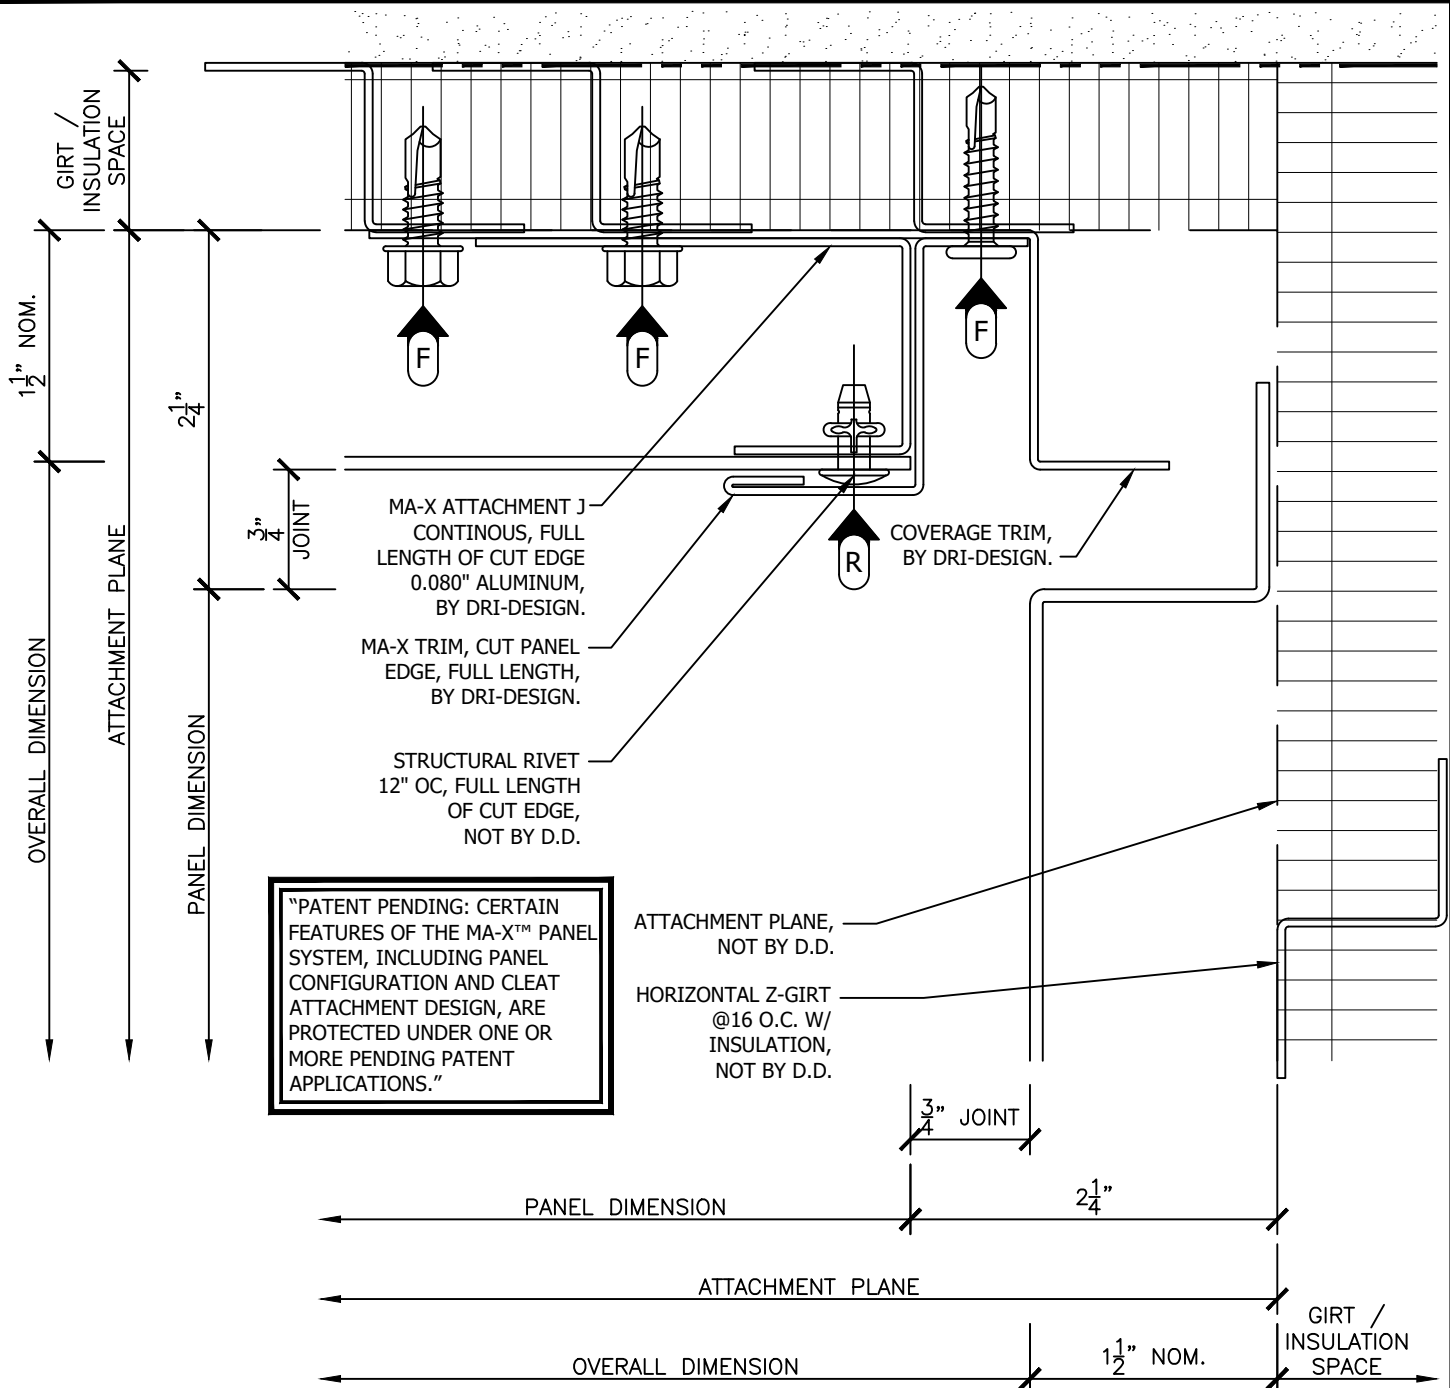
DETAIL #: MA-X VERTICAL SOFFIT AT CTF HORIZONTAL WALL
